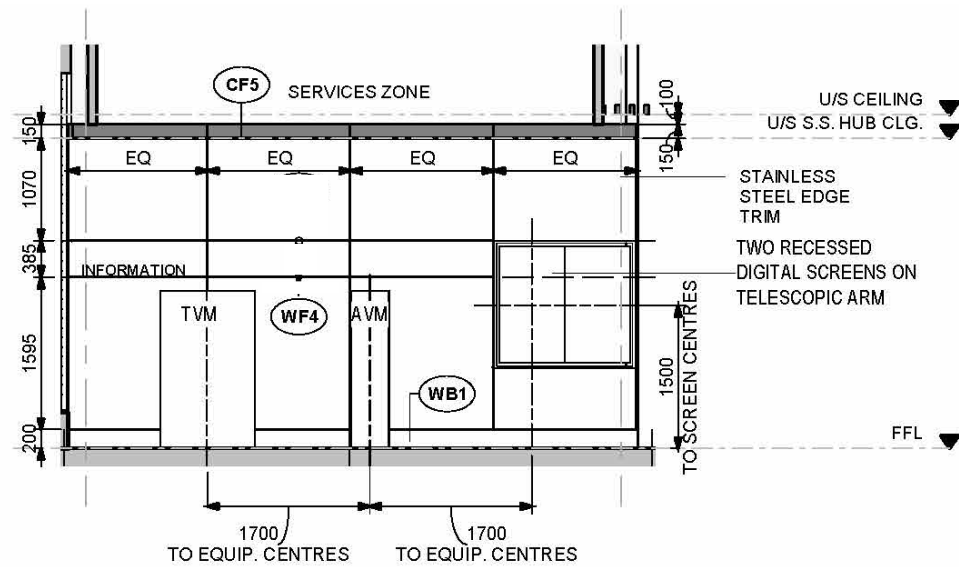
Front elevation of Self-serve Hub wall (All dimensions are noted in mm).
